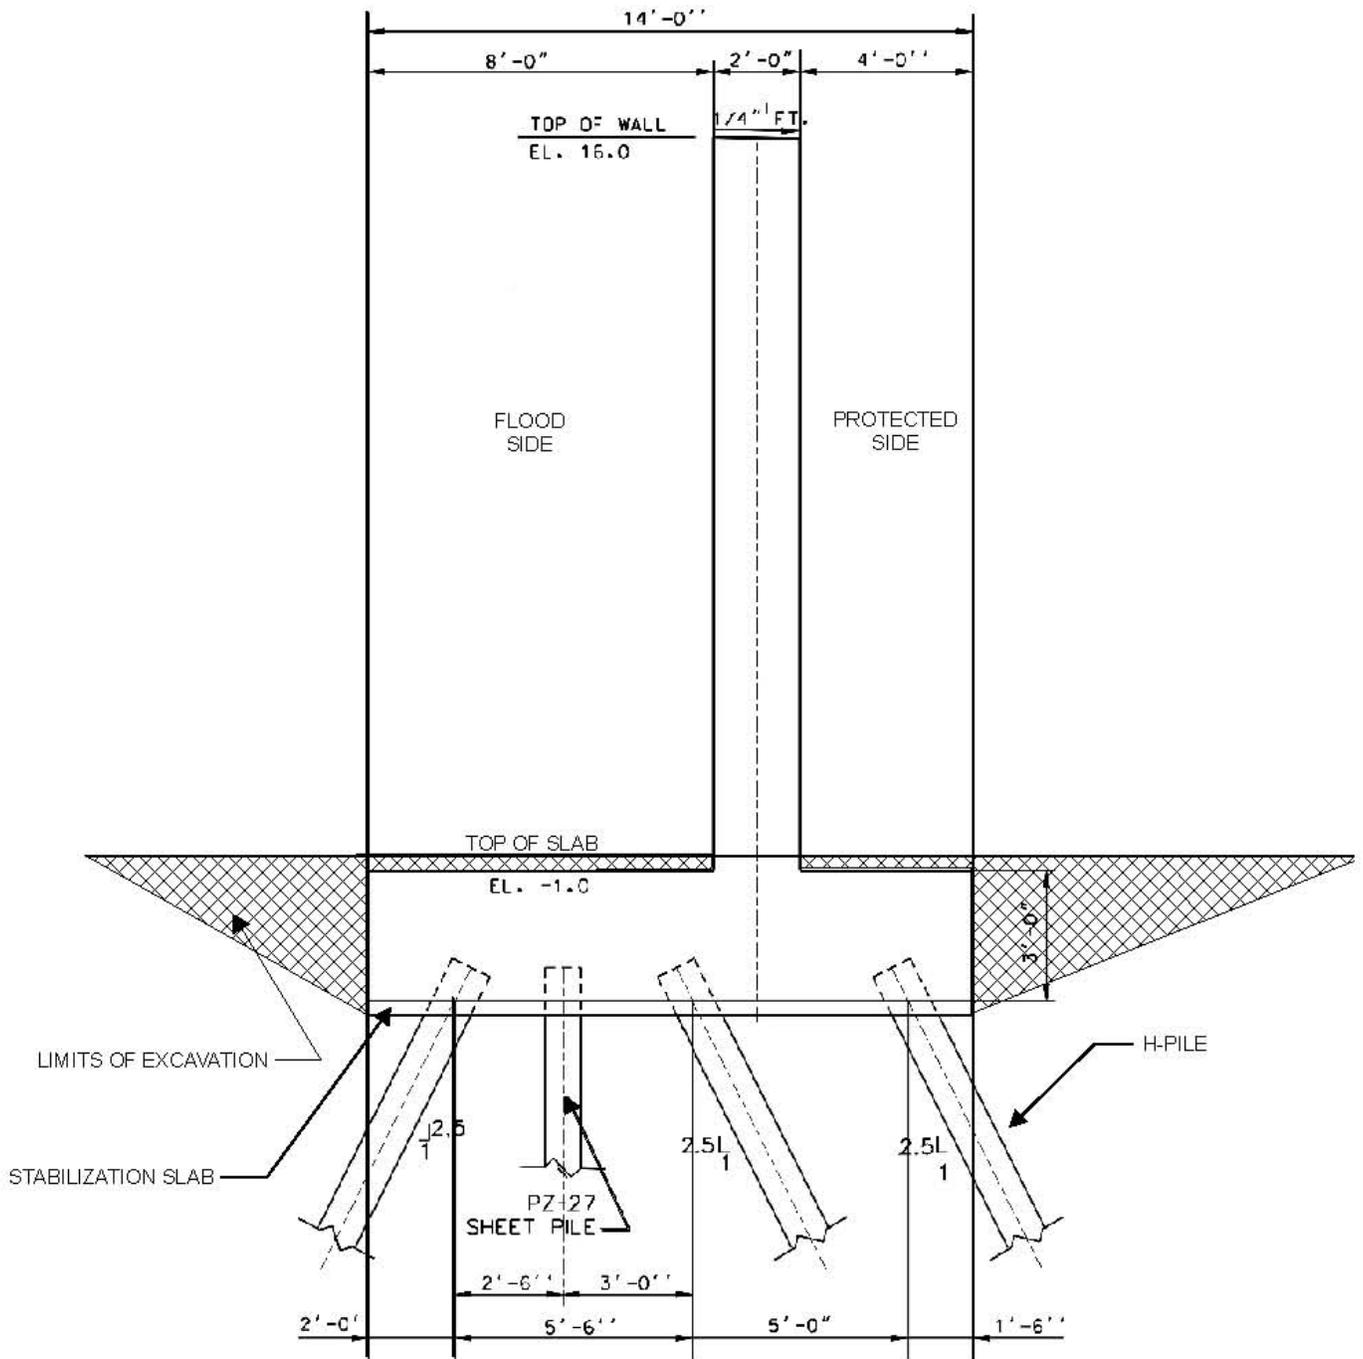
All T-walls would be approximately 2-feet wide supported by a 12- to 17-foot wide and 3-foot high concrete slab connected to battered H-piles (driven to a depth of approximately -85 feet below the ground surface) and a continuous sheetpile cutoff wall (constructed to depths ranging from -50 to -60 feet below the ground surface) for further stabilization and seepage protection.
